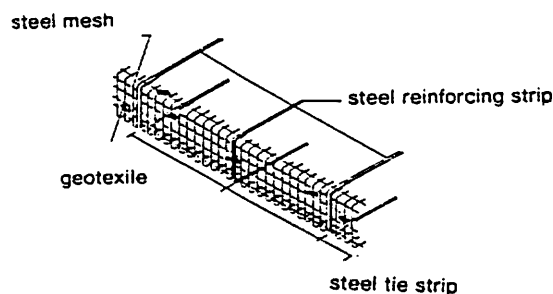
Terratrel facing panel for R. E. retaining walls (Smith, 1991).
